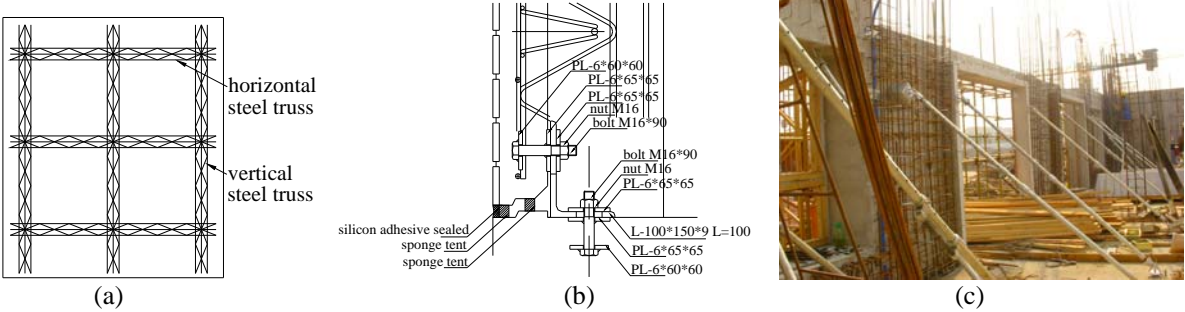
Construction details (unit: mm)—(a) steel trusses of the prefabricated part; (b) construction diagram of the laminated wall; (c) on site picture of the laminated walls
